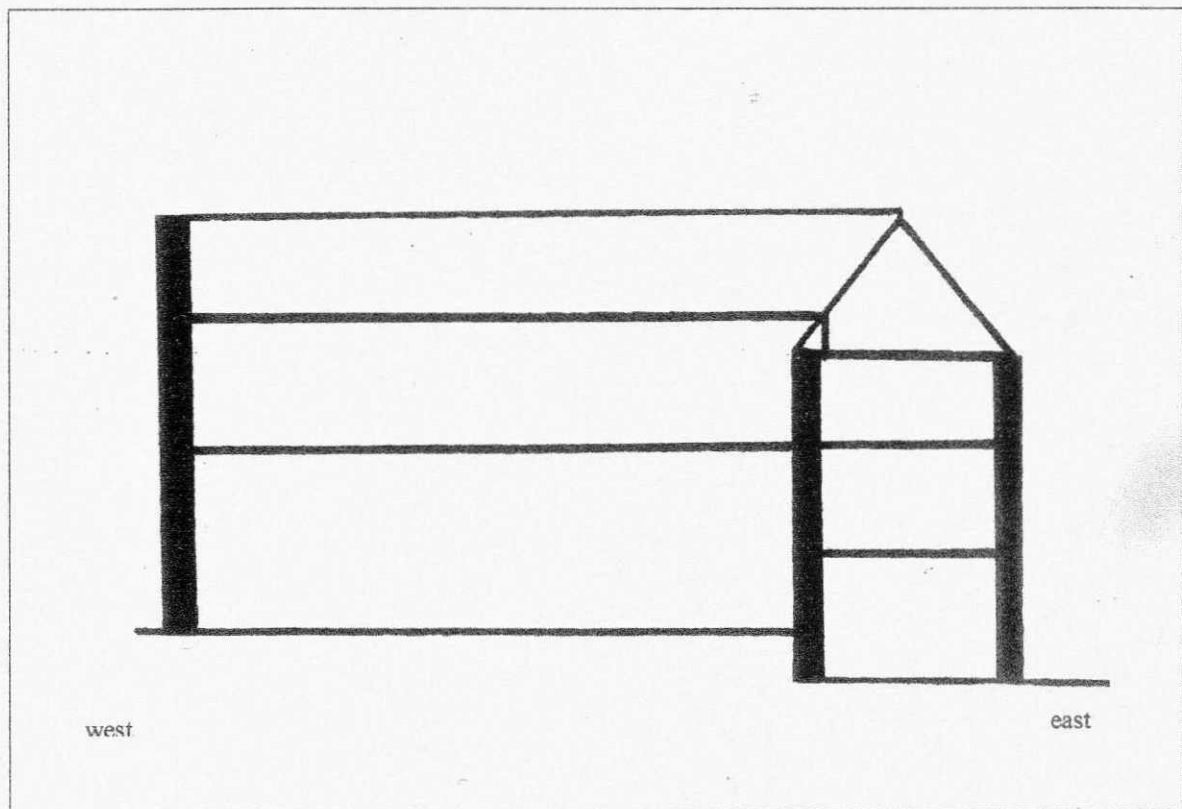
Sketch, not to scale, showing floor levels in hall range and wing
